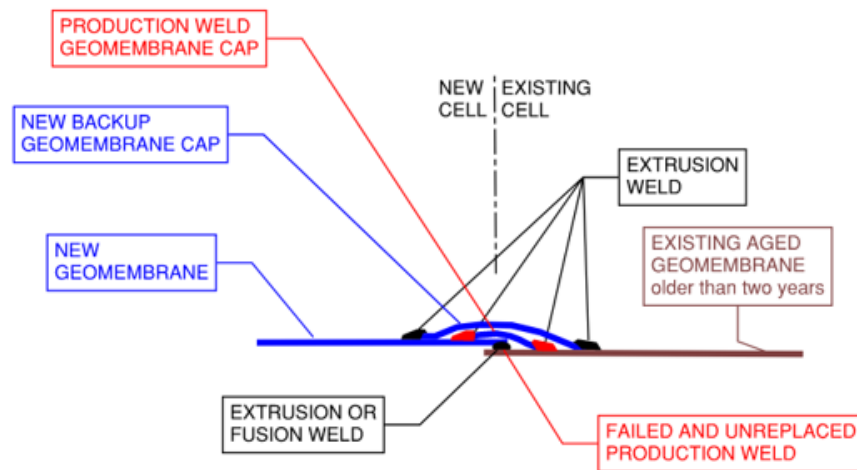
Location of Production Weld Geomembrane Cap
